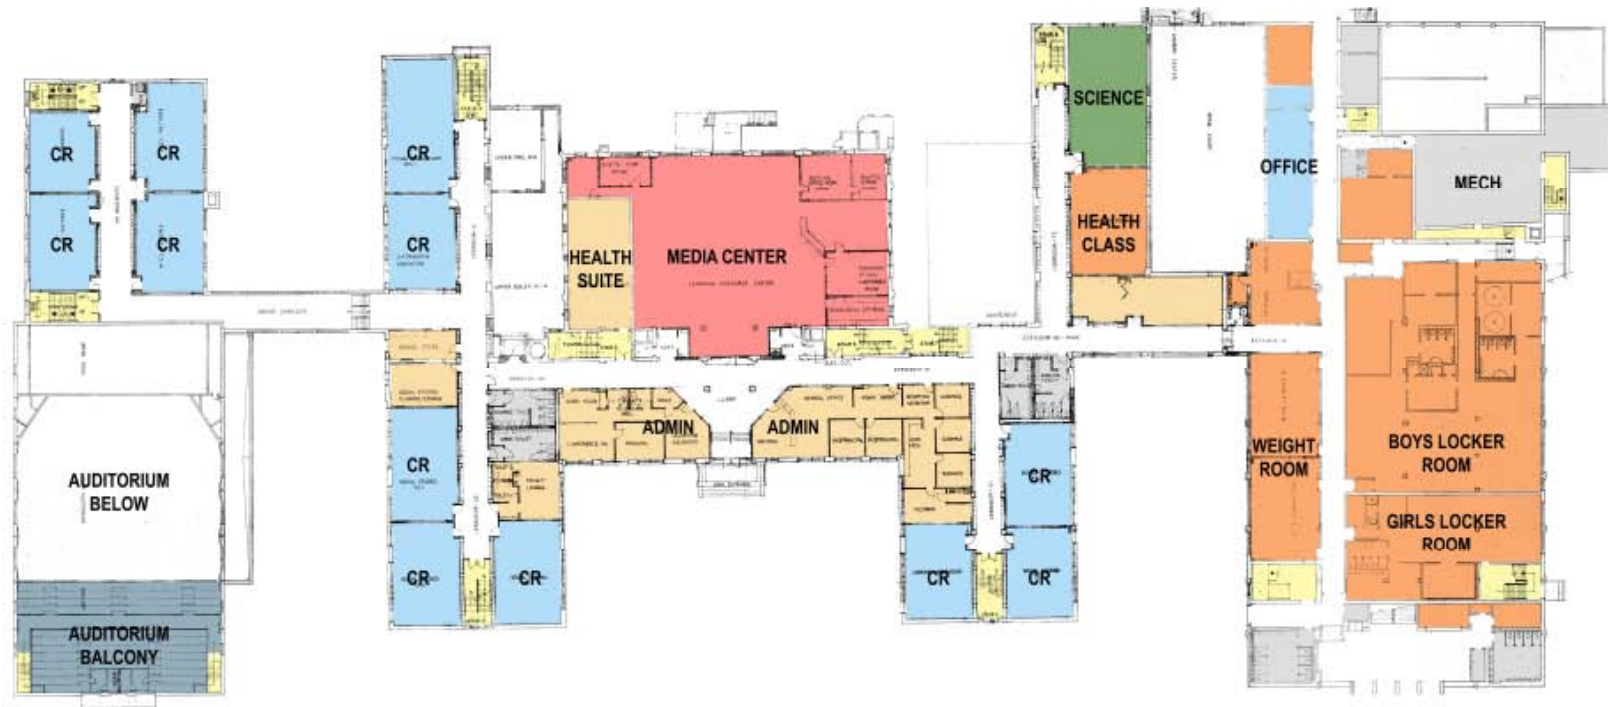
ALLEGANY HIGH SCHOOL MAIN FLOOR PLAN
